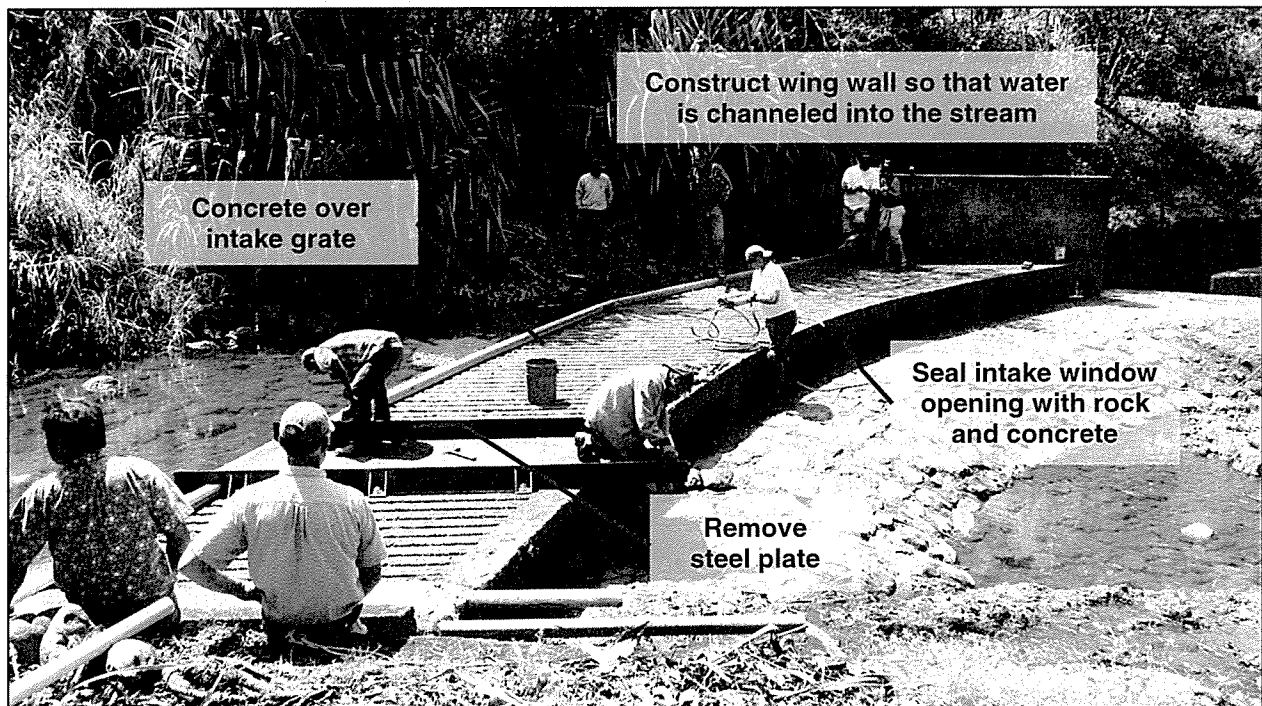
Typical “stream overpass” intended to prevent the ditch from intercepting a stream.
